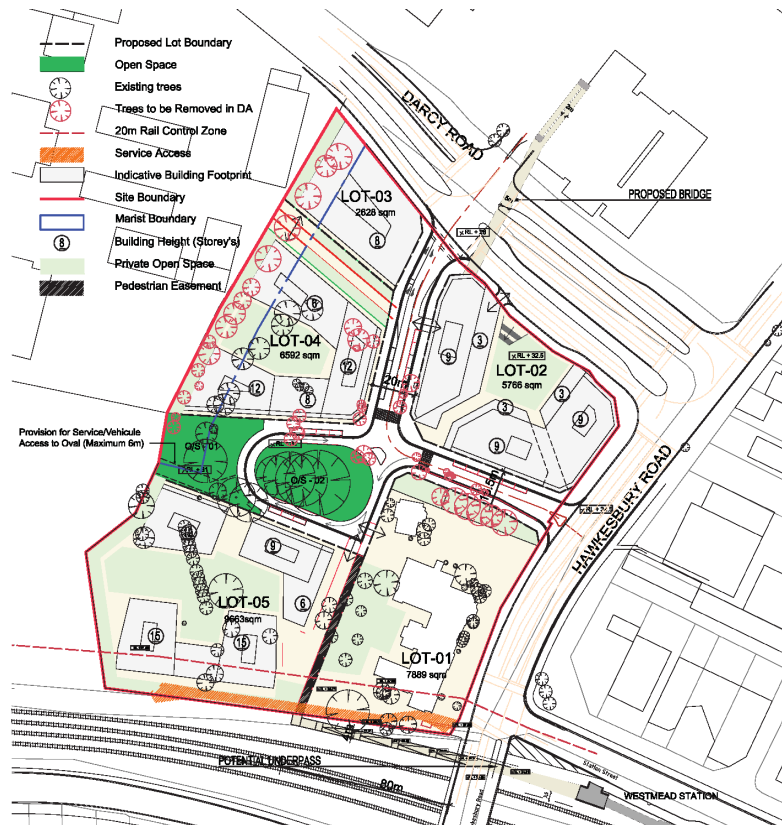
Approved Concept Plan demonstrating a U-Shaped development on Lot 4.
